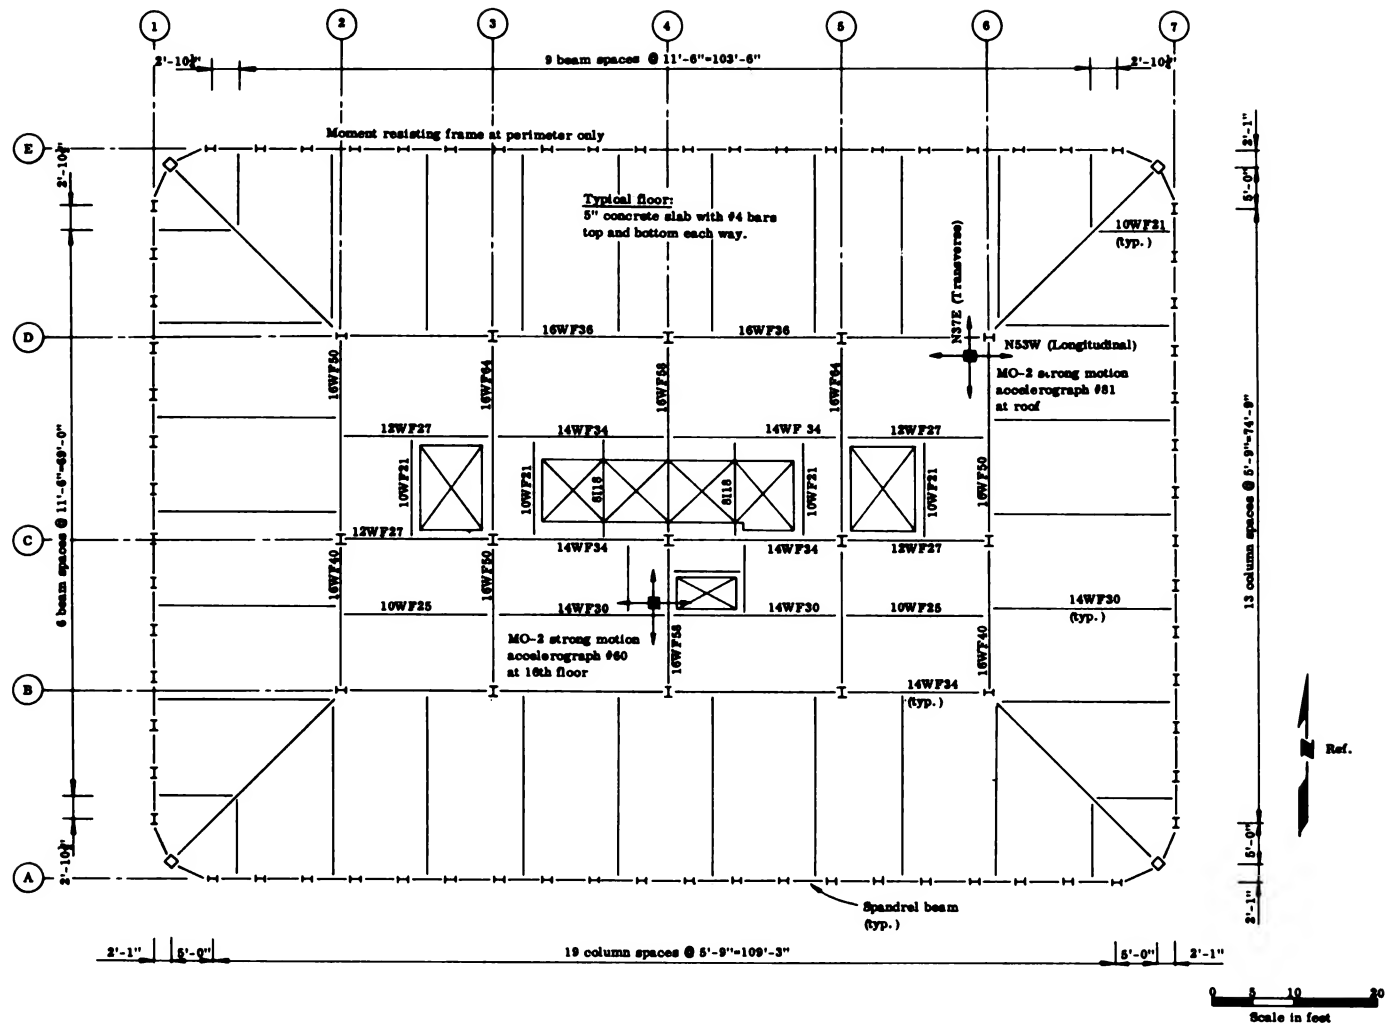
Bunker Hill Tower. Typical floor framing plan.
